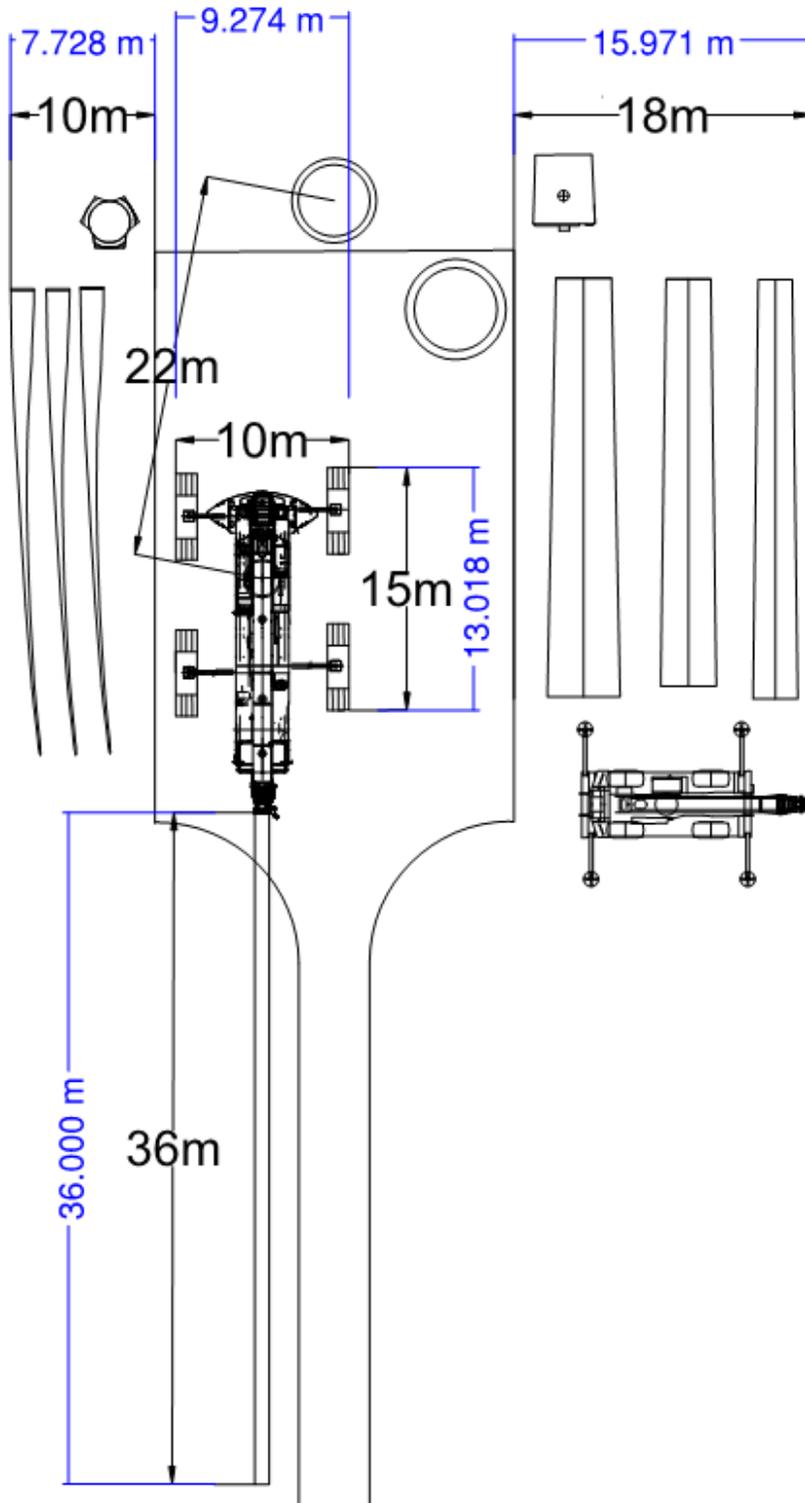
Schematic of proposed wind turbines to be installed at Rankin Inlet and Baker Lake with sizes of component parts
